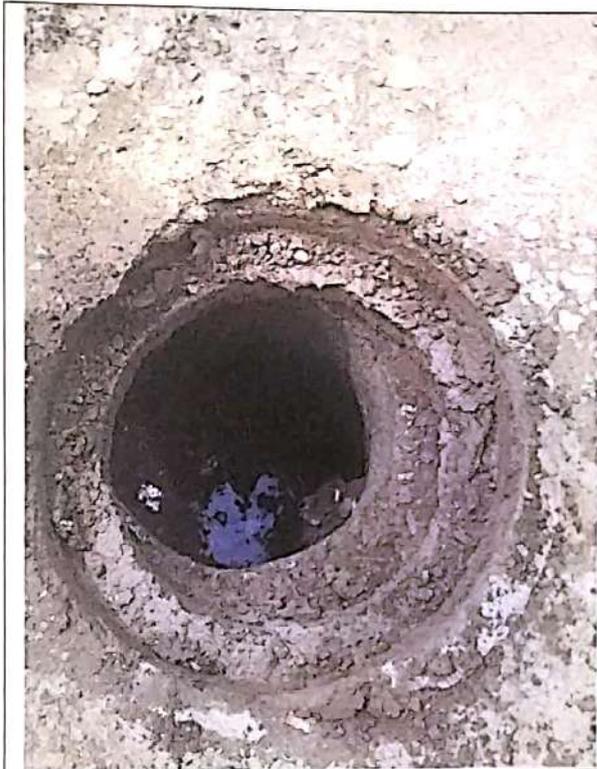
Inspection of sewer pipeline with Manholes at Sarkari Fael area
